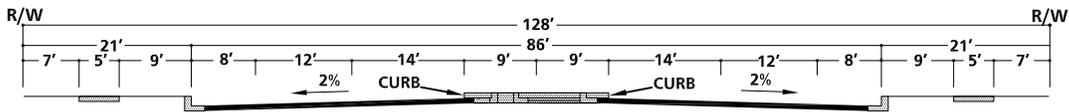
CITY OF EASTVALE GENERAL PLAN ROADWAY CROSS-SECTIONS
